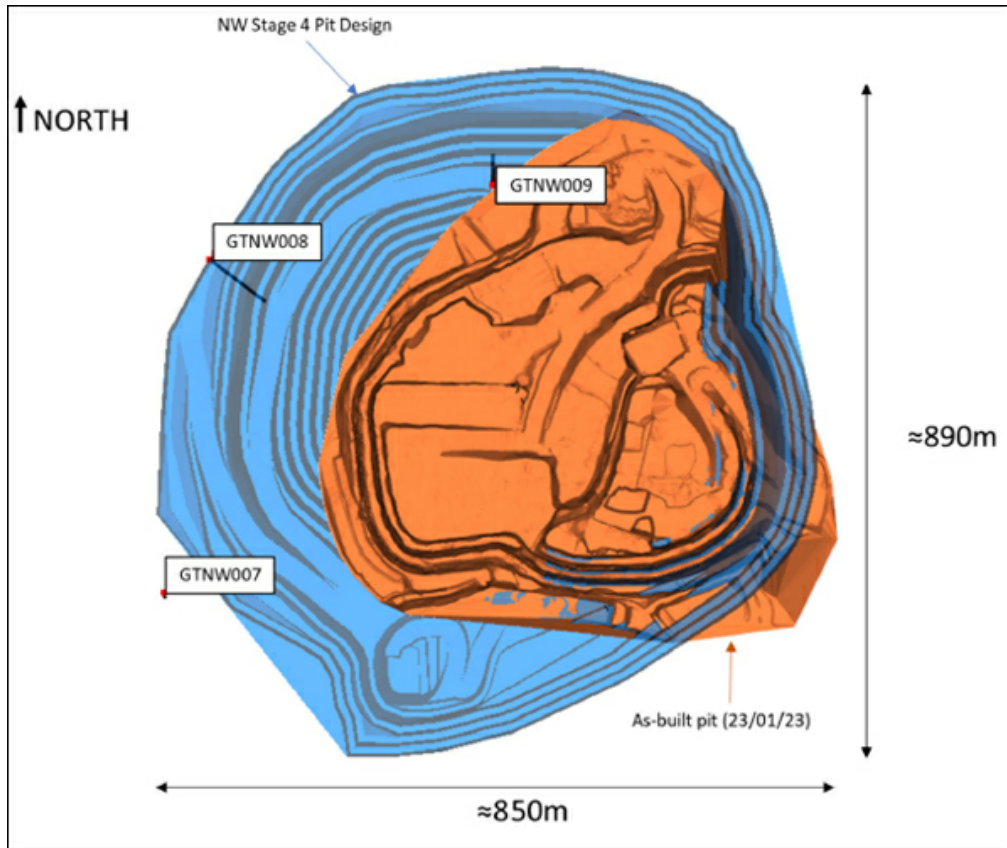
Plan view of Mt Cattlin, with the location of the geotechnical drill holes and basic pit dimensions.
